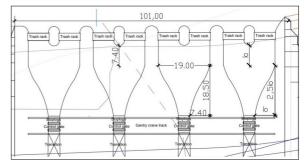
,3 - Longtudinal profile of excavation & Front view of excavation Own presentment
